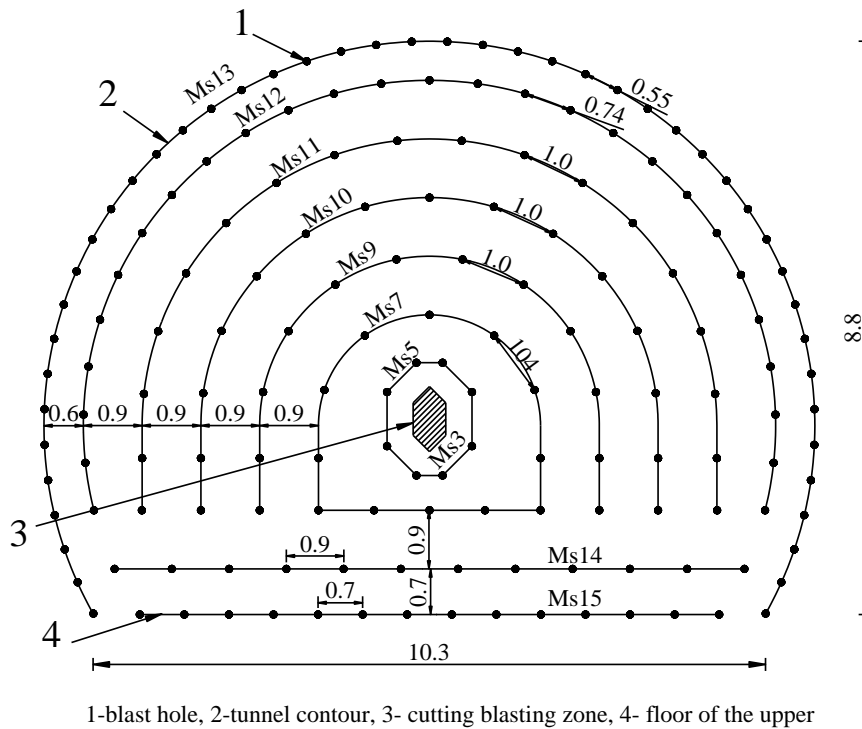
Section of drilling layout for upper blasting excavation of pressure diversion tunnel (unit: m)
